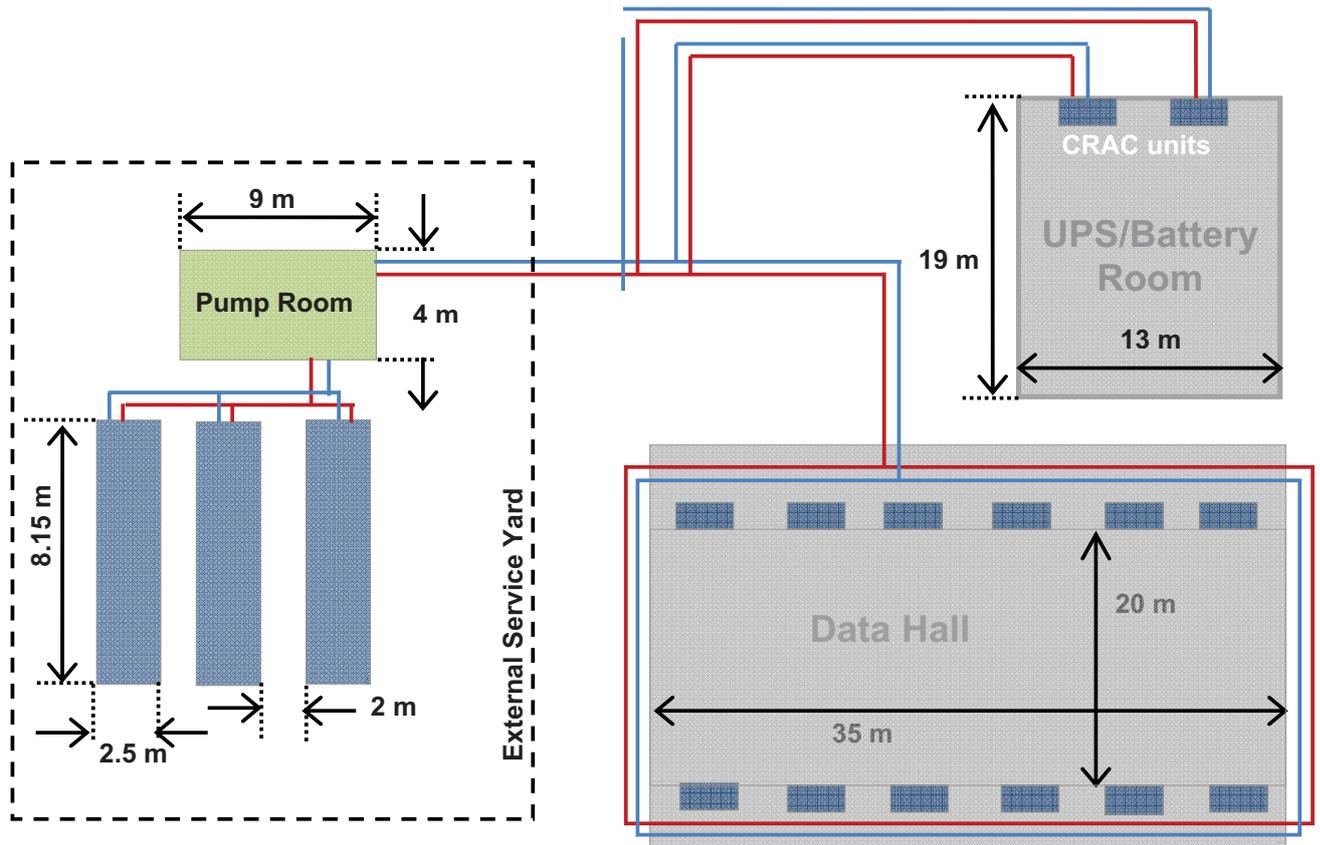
Typical cooling plant arrangement to deliver 1MW of cooling across a 700m² data hall for a chilled water system
